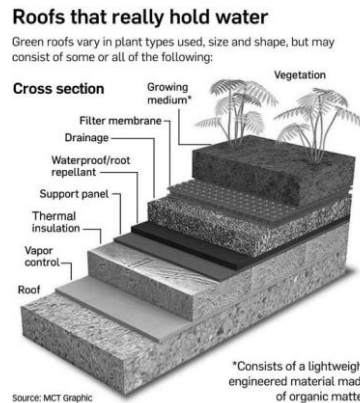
3D view of green roof (Source: <https://s-media-cache-ak0.pinimg.com/564x/57/bc/e3/57bce36b2ddb7f8b77acf721b37219f1.jpg>)
